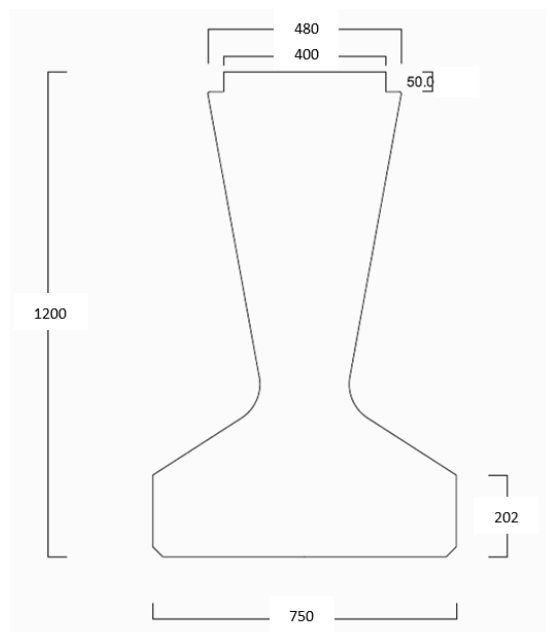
Dimensions of the pre-stress beam (all dimensions are in mm)
